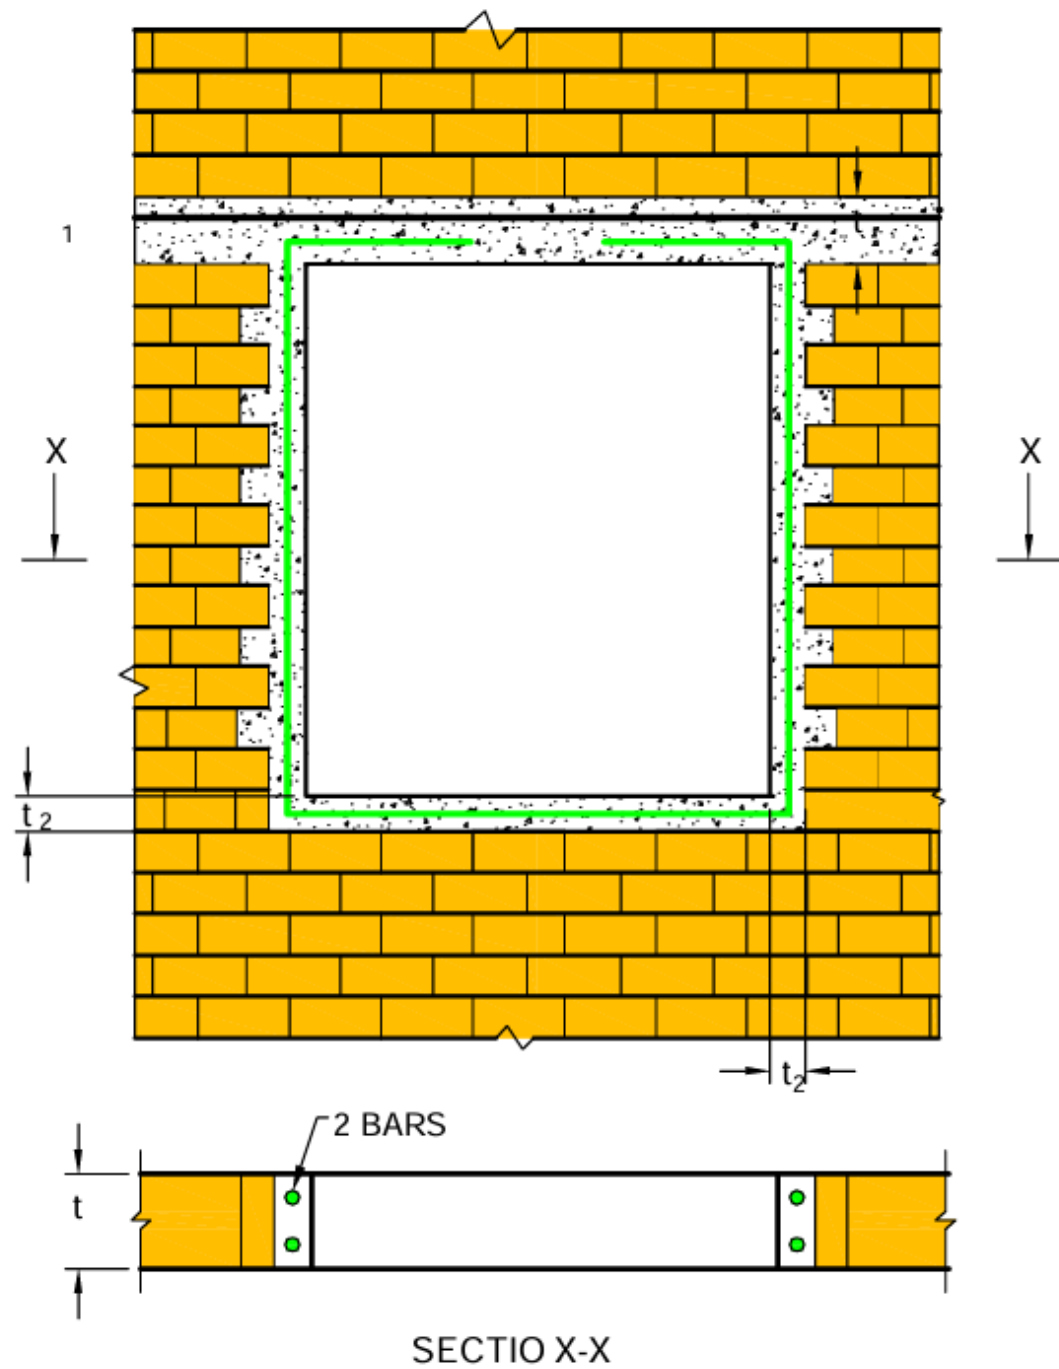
STRENGTHENING MASONRY AROUND AN OPENING
